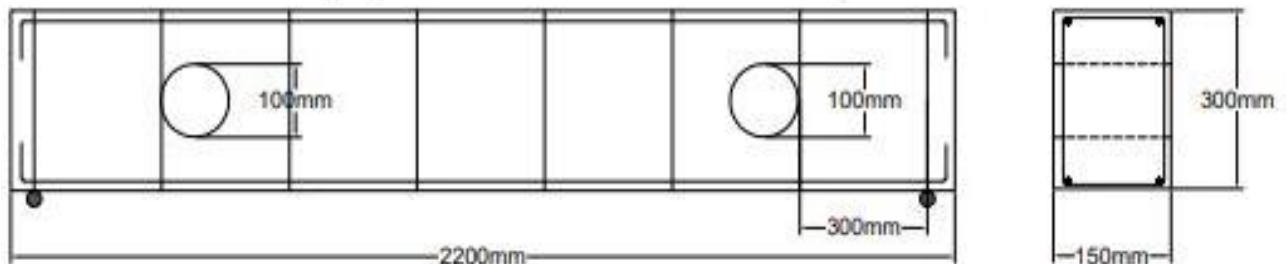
(d). Illustration of test beams (B2 and B10) with two openings and 100mm diameter PVC pipes placed transversely at both shear zones.
